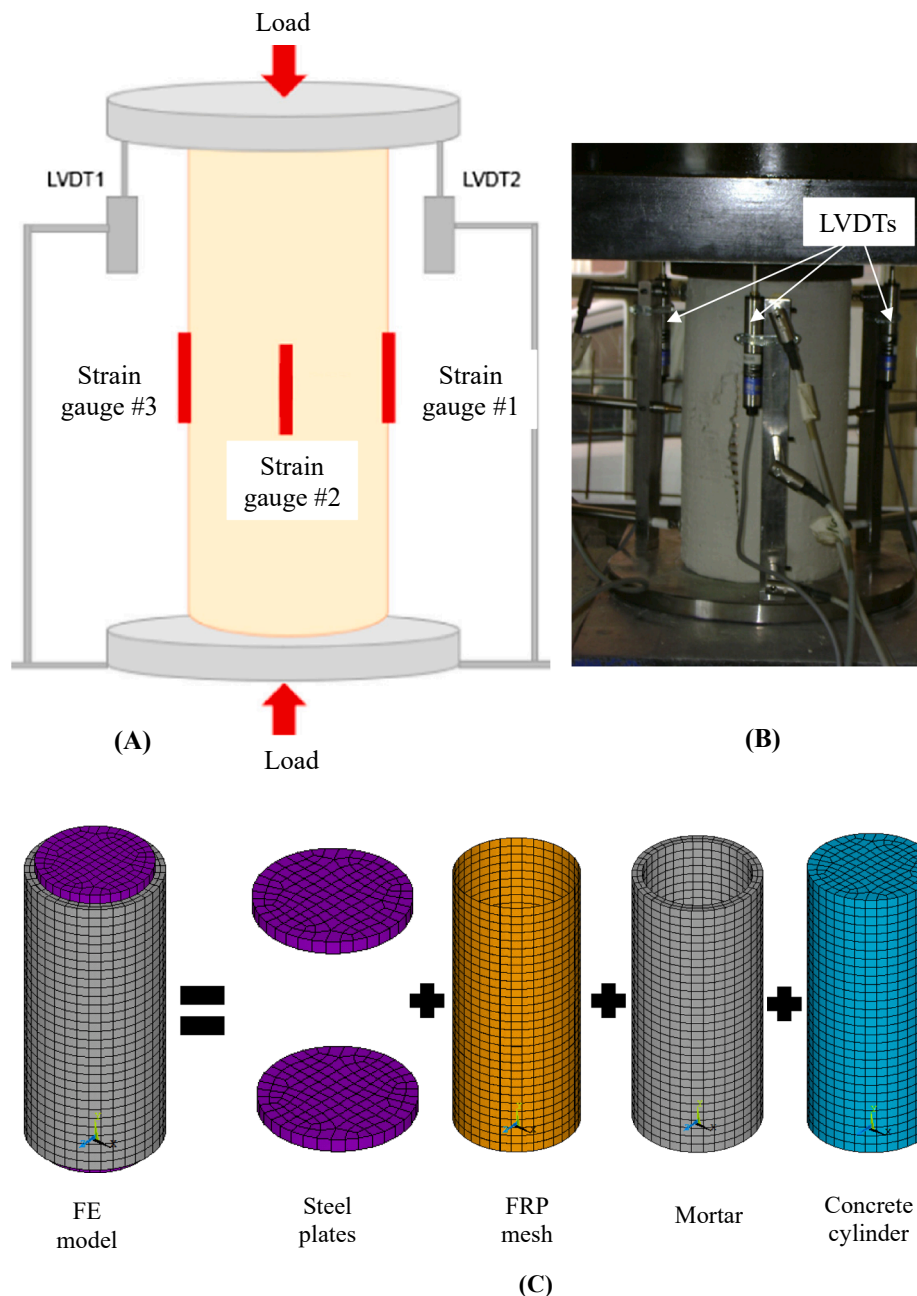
(A) Schematics of test setup and instrumentation [8]; (B) photo of specimen undergoing testing [3], and (C) typical FE model of FRCM-confined concrete cylinder.
